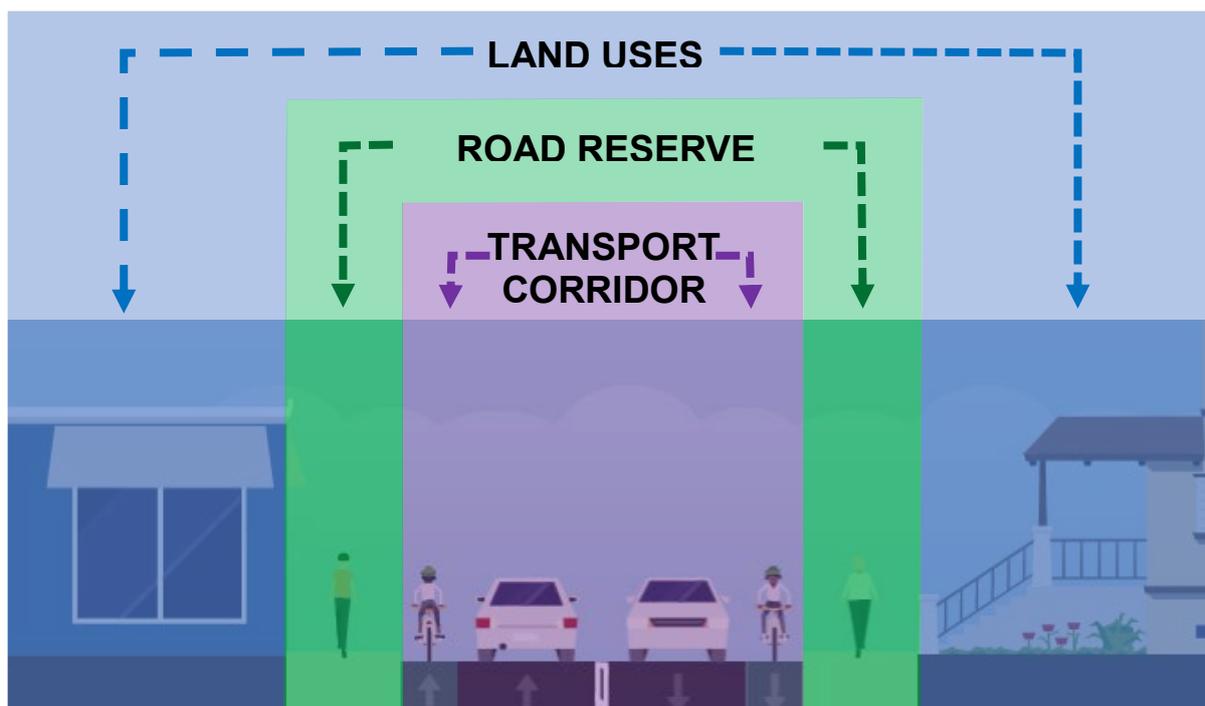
Typical cross section of a road-based transport corridor. Source: InfraPlan
